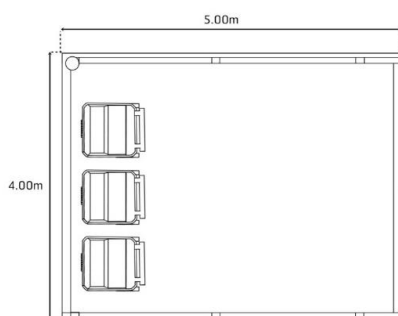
Layout in above view shows table and chair position in cafeteria building.
